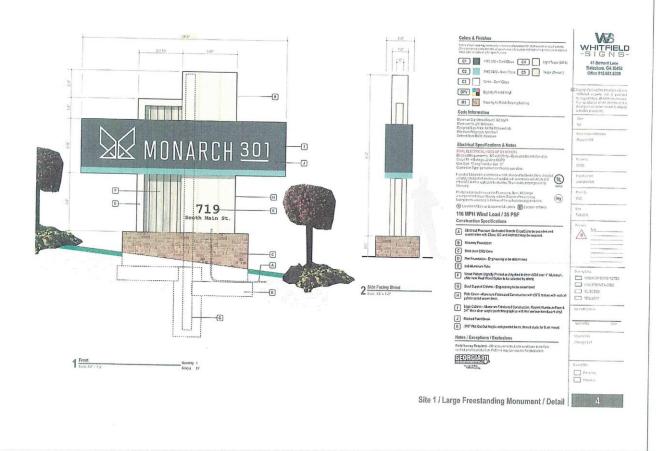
EXHIBIT D: PROPOSED SIGNAGE PLANS (CONT)
